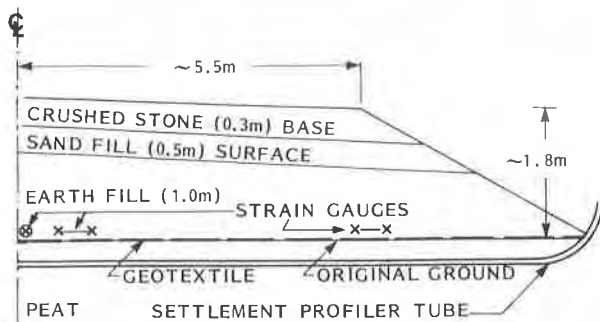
Manchester Detour Cross Sections showing construction and instrumentation details
